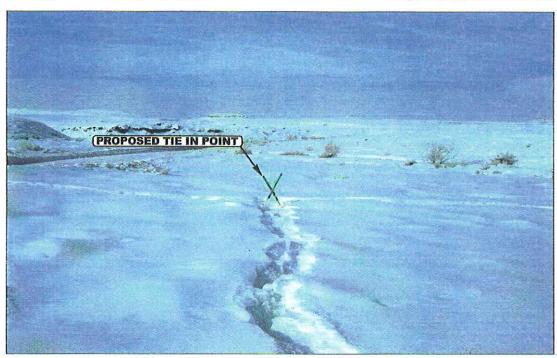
PHOTO: VIEW FROM OF PROPOSED TIE IN POINT
